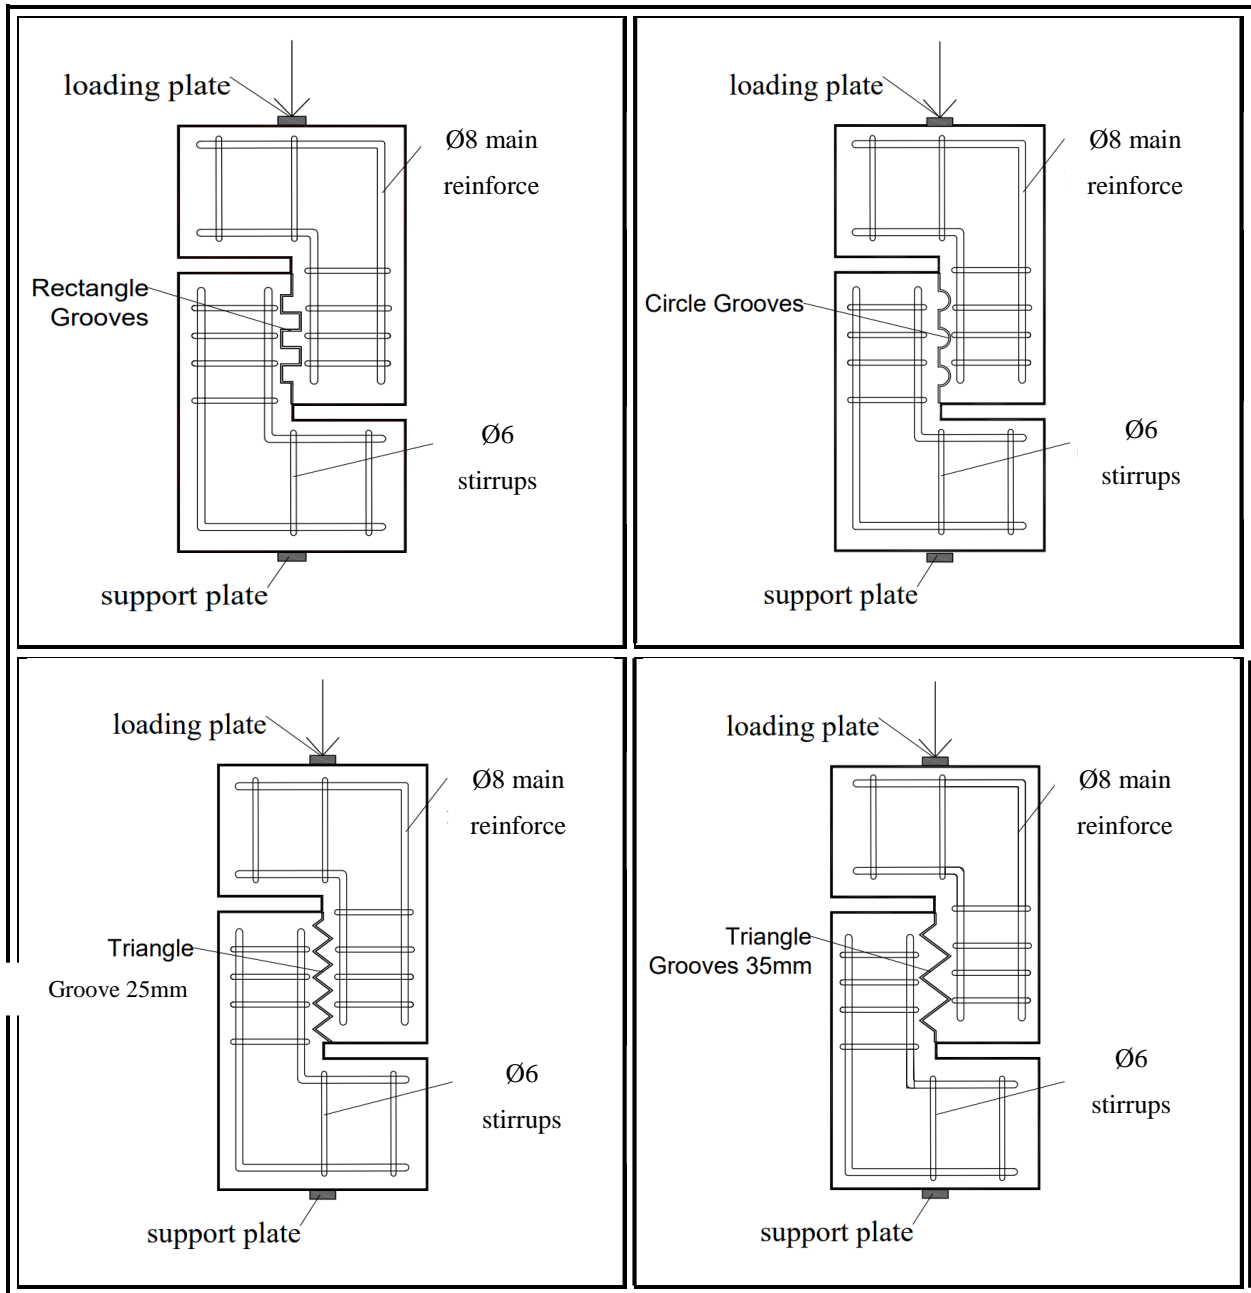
5. Geometric and reinforcement details for grooved specimen.
